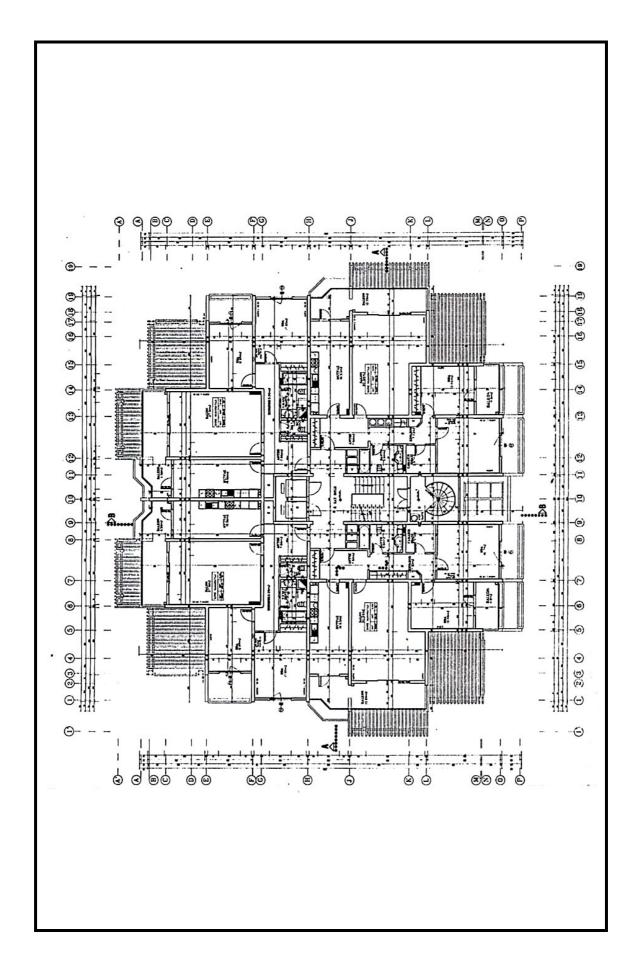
Mavişehir II; Flamingo 19th-Floor Plan
